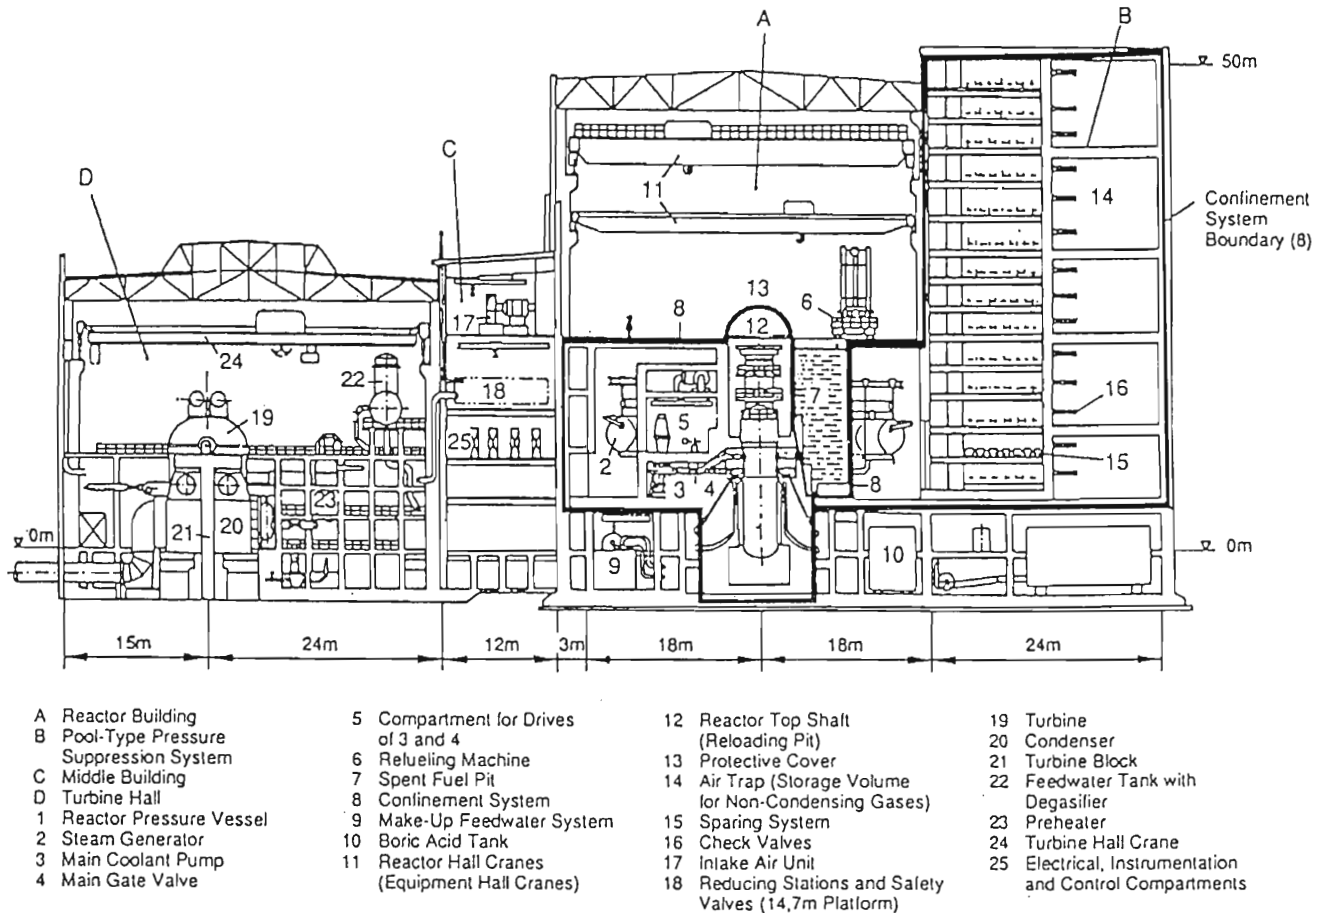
Sectional Drawing of WWER-440/W-213¹⁵⁾
